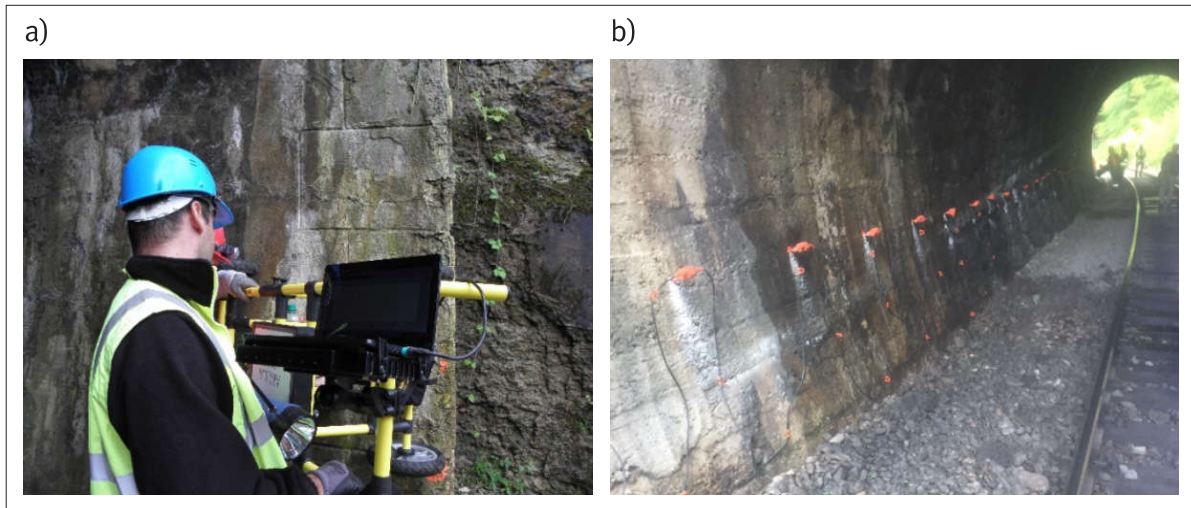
GPR testing, tunnel Lupinjak (a); MASW testing, tunnel P. Glava (b)
